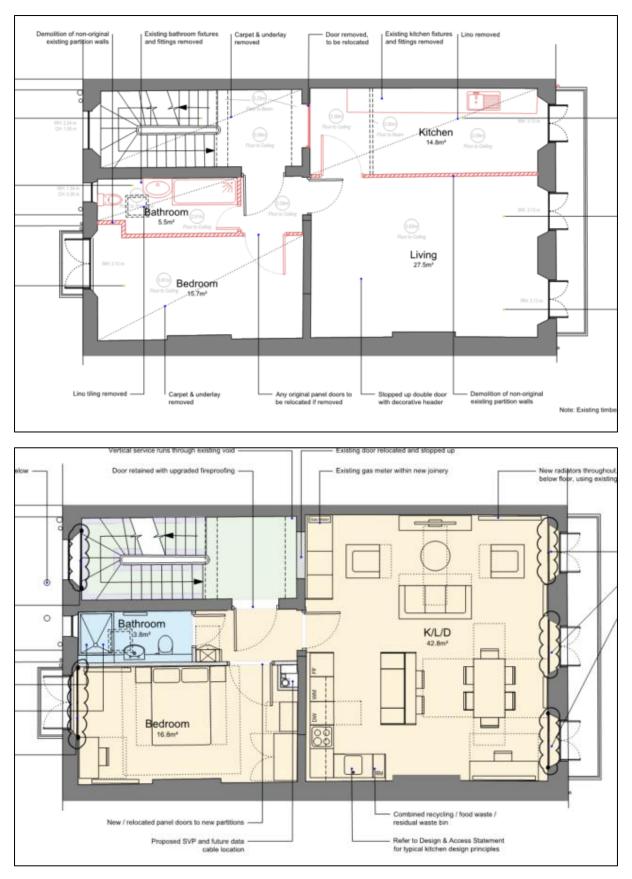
Existing (top) and proposed (bottom) first floor plan.
